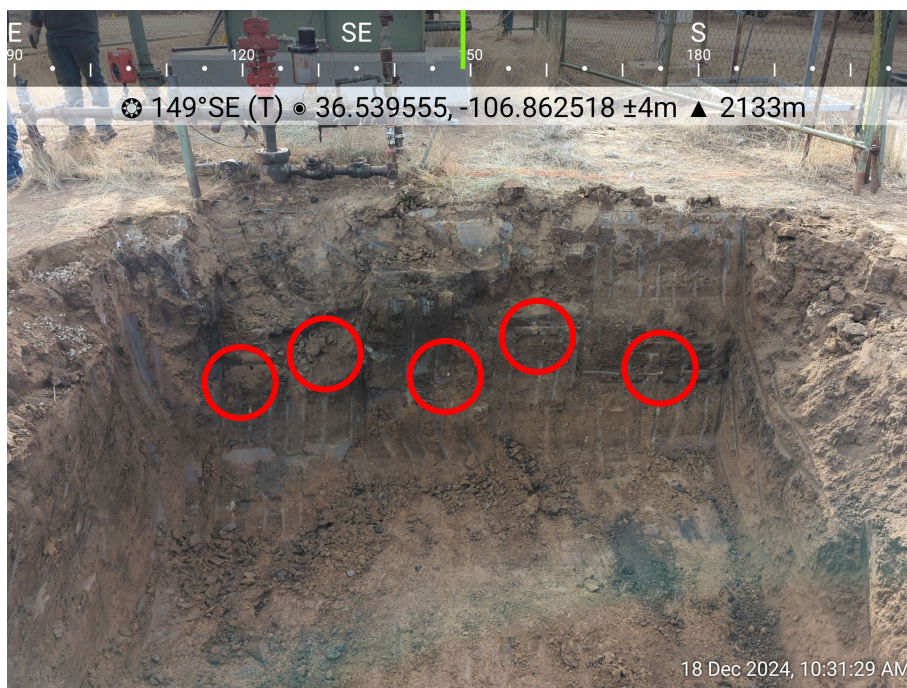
SS07 collected as a 5-point composite sample from south sidewall of excavation area.
